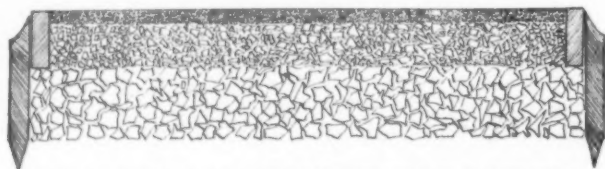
SECTION OF A CEMENT SIDEWALK PAVEMENT
